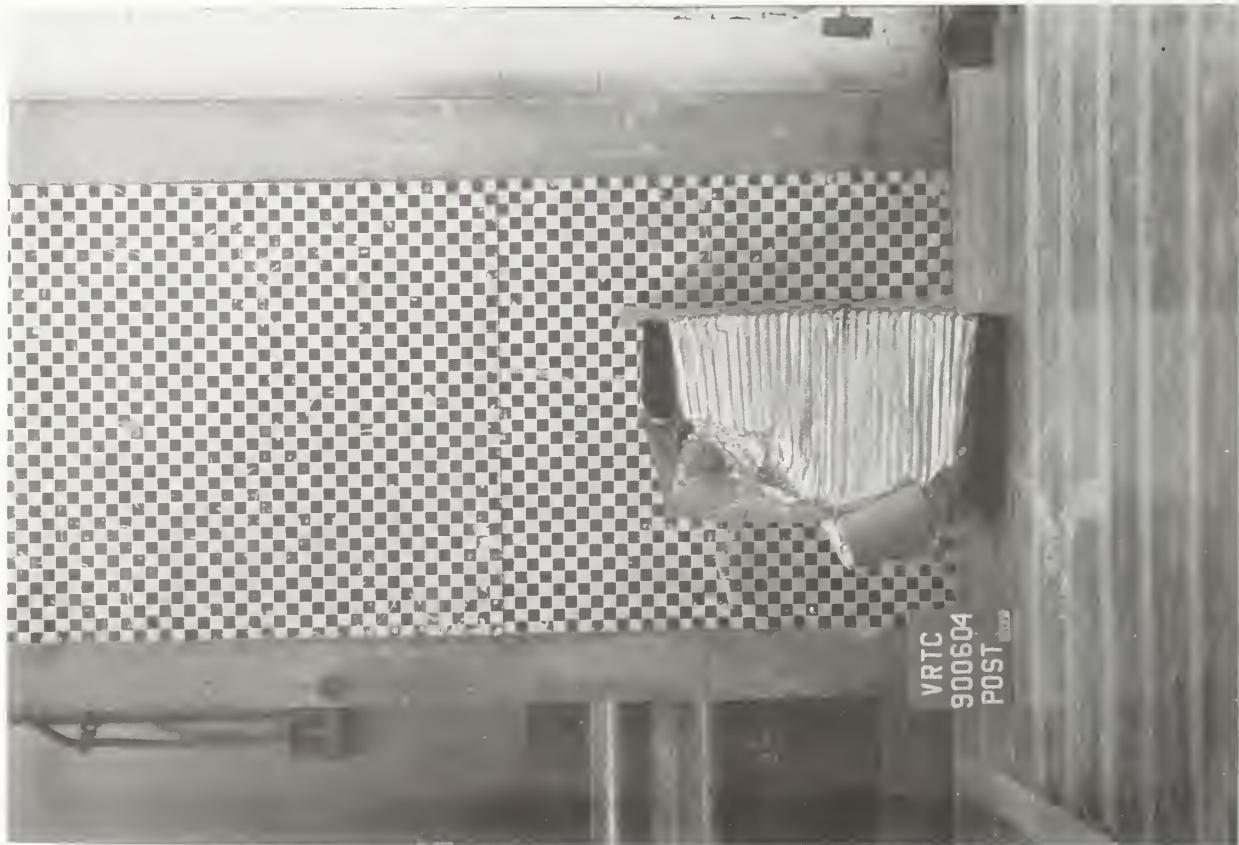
POST-TEST BARRIER FACE - VIEW 1
